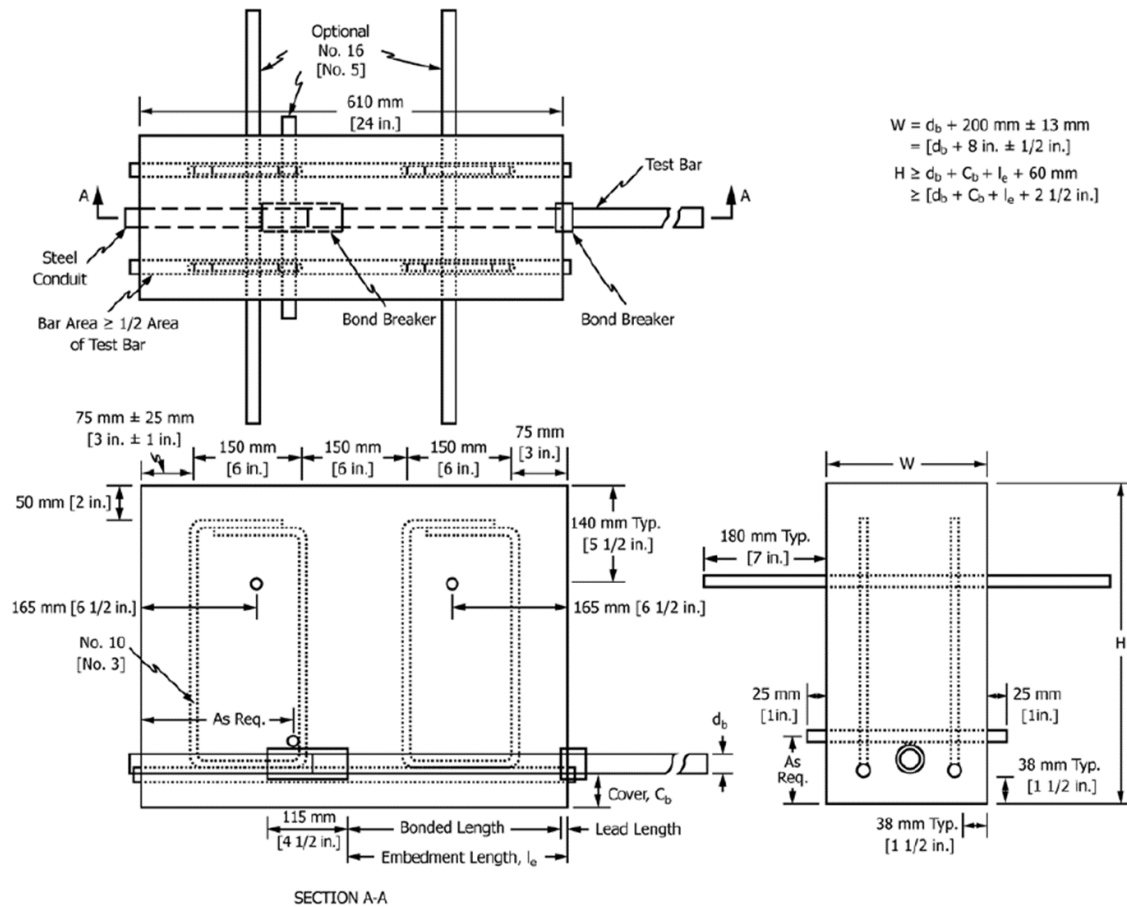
Bond test specimen detailing from ASTM A944[52]. The width, W , for the specimens in the test program was 9 inches and the height, H , was 26 inches. The length parallel to the test bar was 24 inches.
